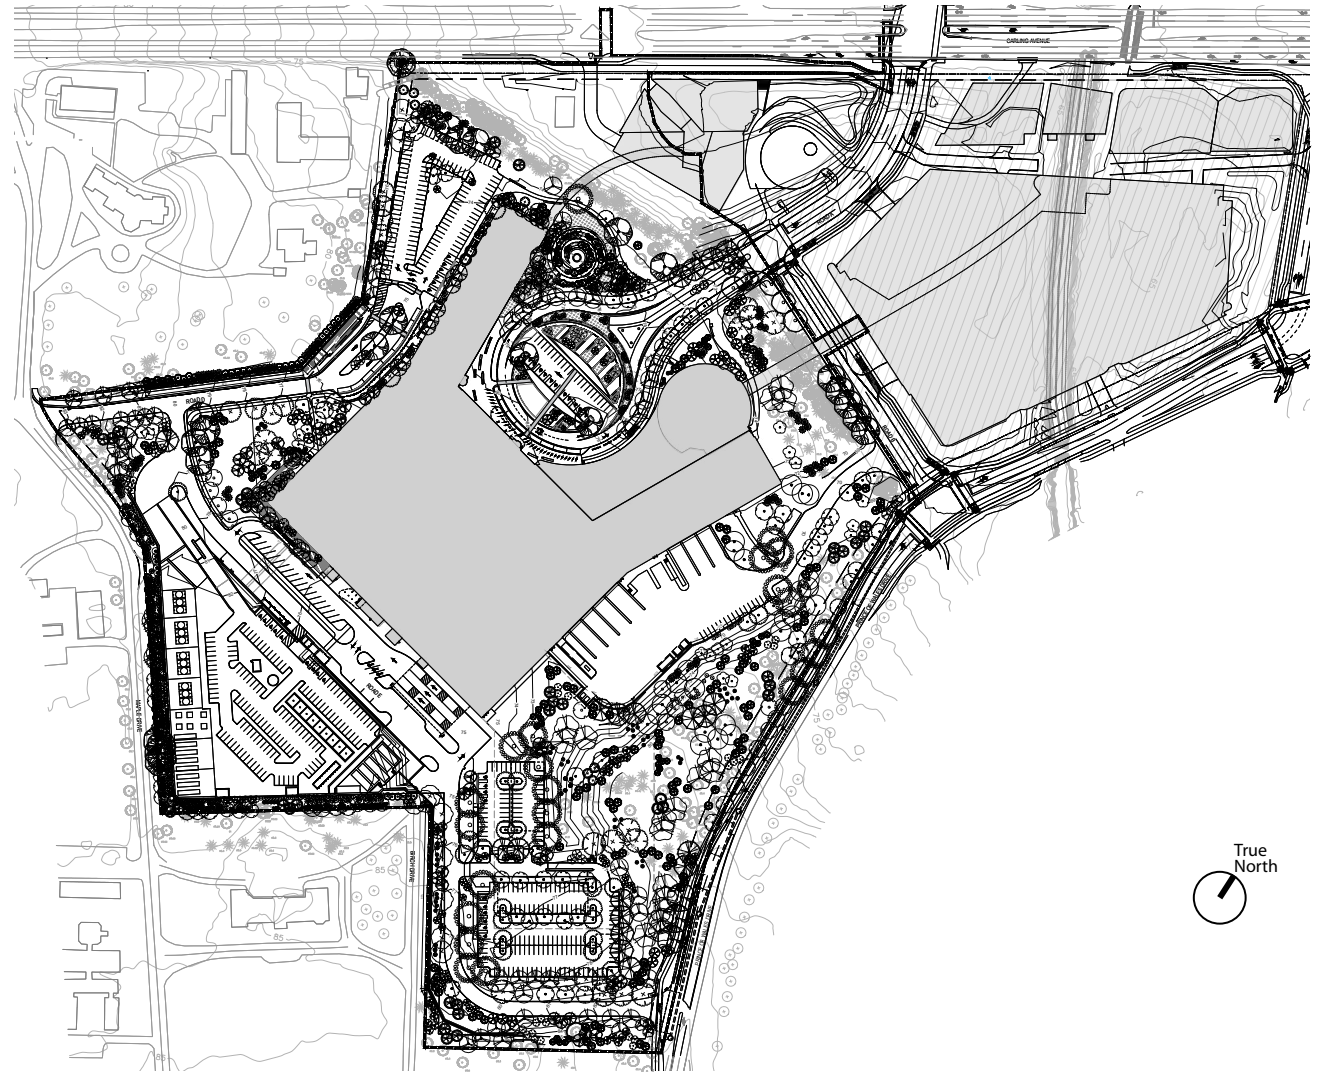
Master Site Plan-Open Space, Landscape and Grading Concept Plan
